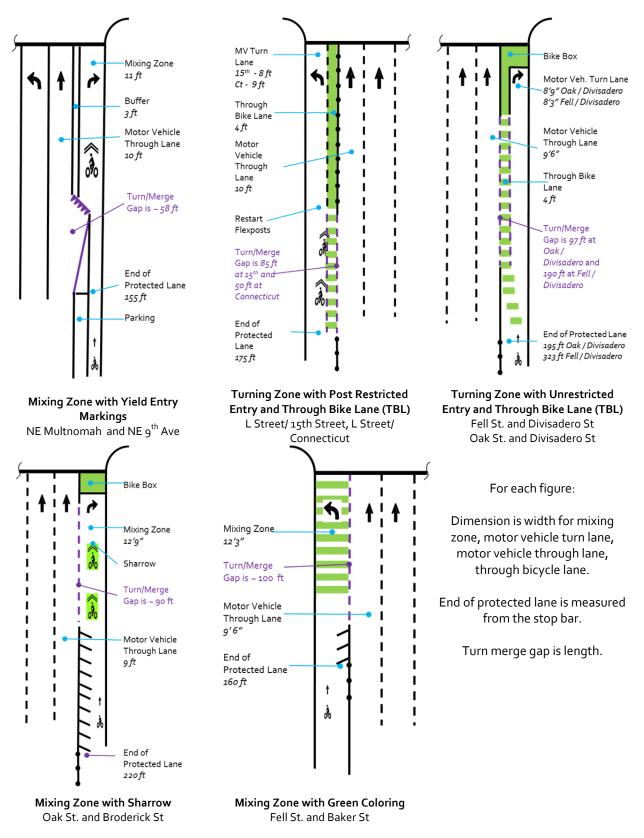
Plan Schematics for Intersections (Not to Scale and Not all Design Elements Shown)
